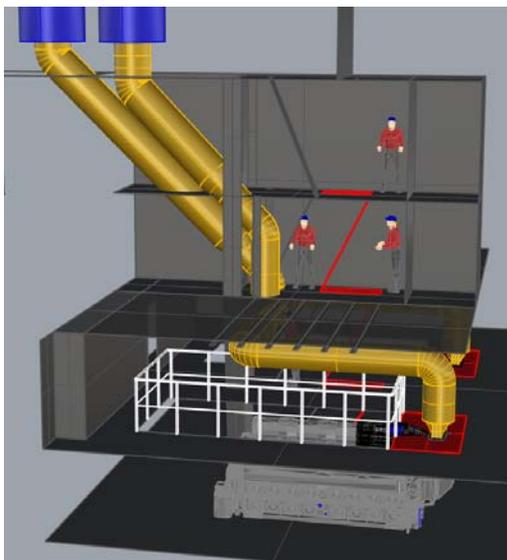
3-D view of the EMD and potential arrangement with one exhaust pipe per engine
